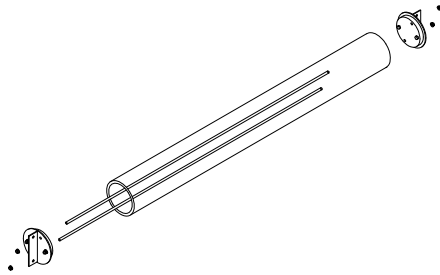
Shigeru Ban Studio at KUAD, post-stressed connection between paper tube and steel joint with two threads, 2013
